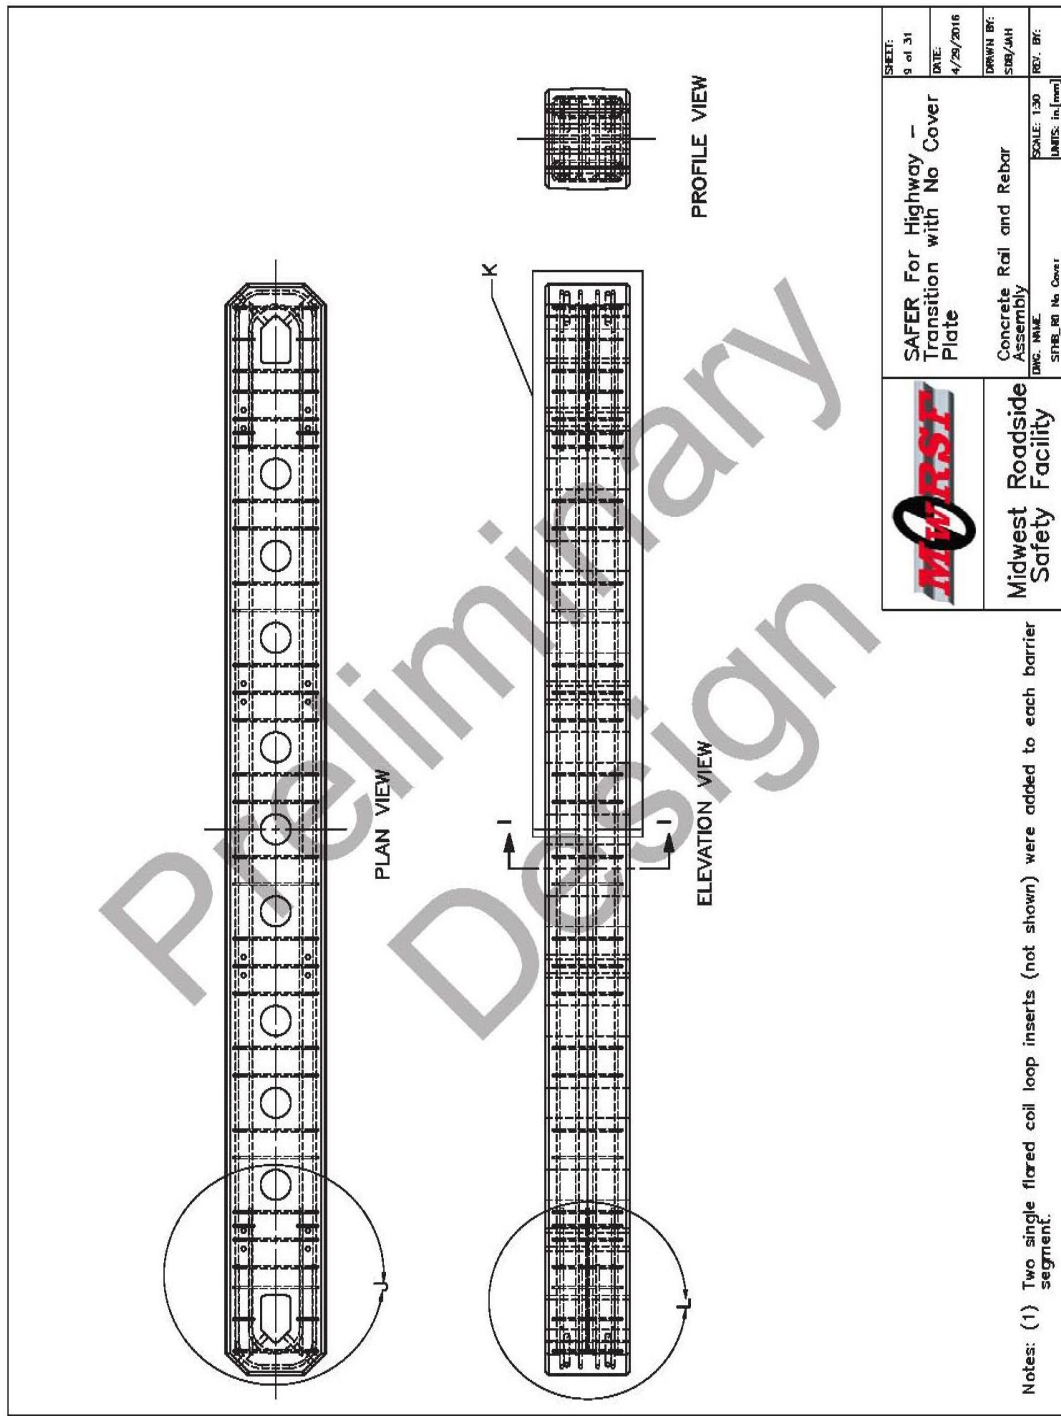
Concrete Rail and Rebar Assembly, No Cover Plate, RESTORE Barrier Transition
